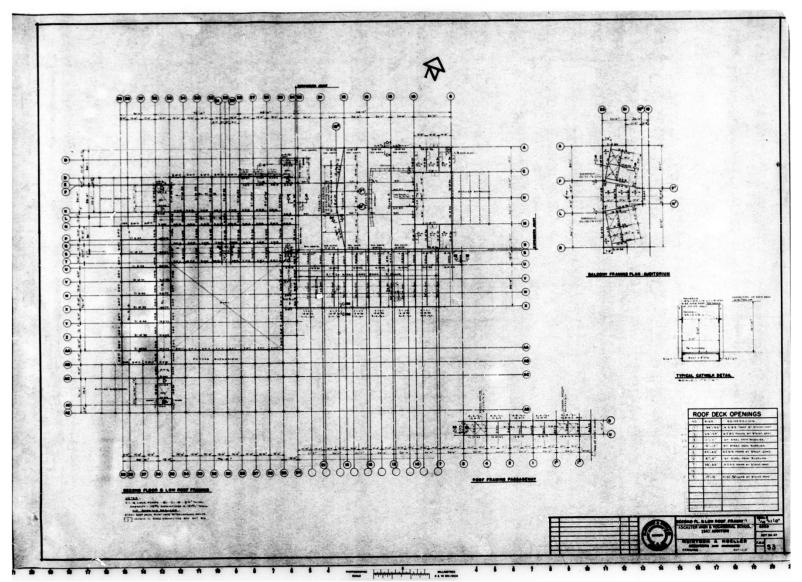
Ancaster High – McIntosh & Moeller, Second Floor Plan, West Wing Addition (Auditorium) 1967 (Slide 41-138: Provided by Hamilton Wentworth District School Board Archives)
